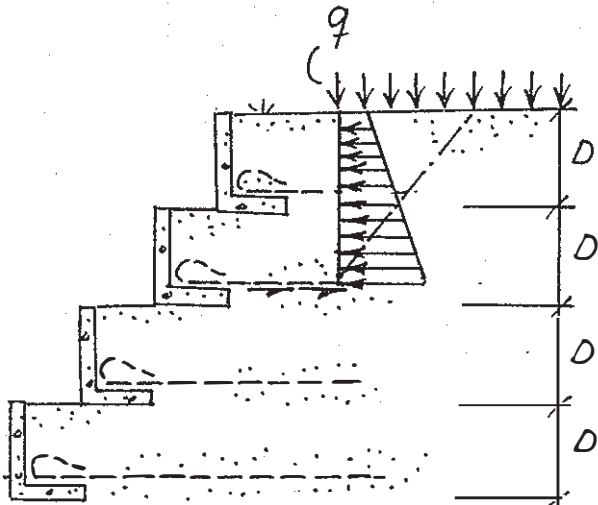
Required tensile strength of fabric reinforcement-sloping wall
